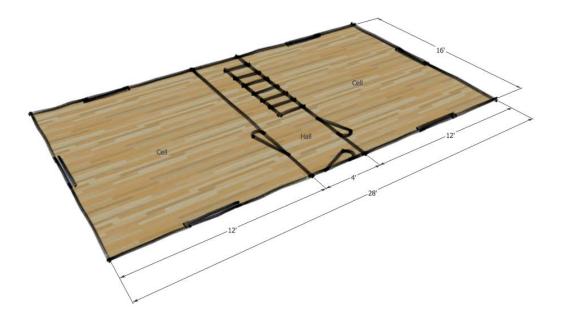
Drawing of the first floor of the 1881 Pine Level jail. Note that the second floor would have had the same layout. (Drawing by the author)
